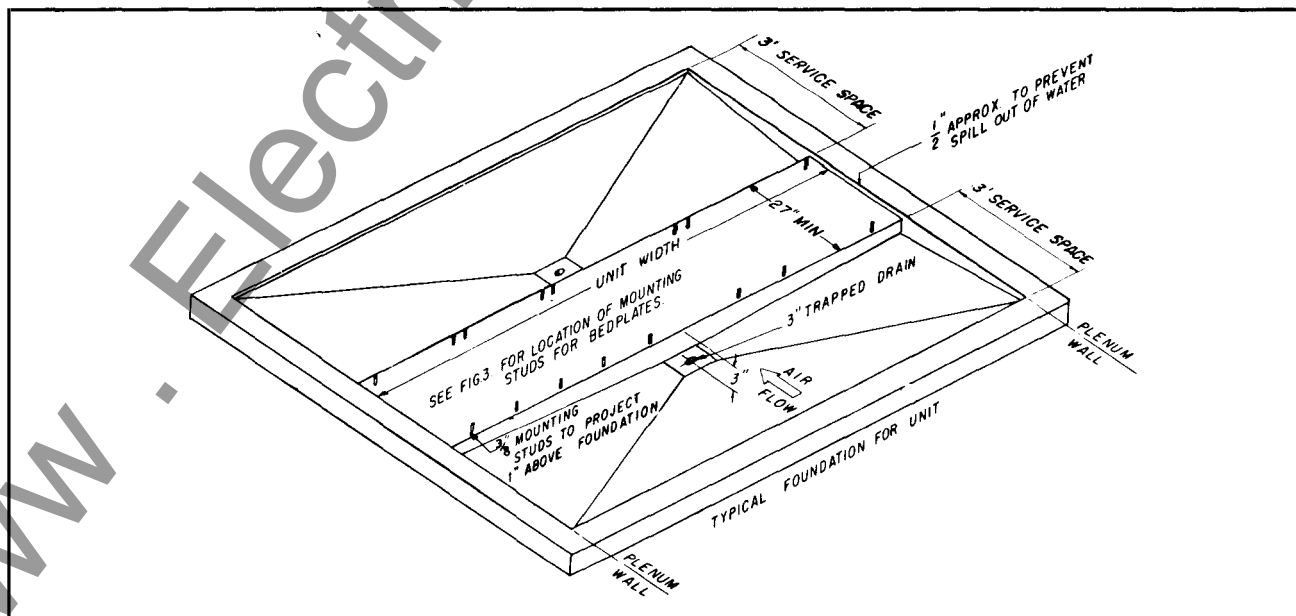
Typical Foundation and Drain Basin (Code PX-4022 Unit Shown)
